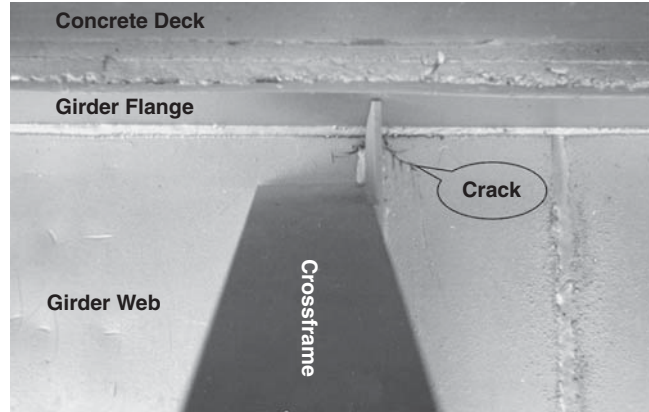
Typical web-gap fatigue cracking.
